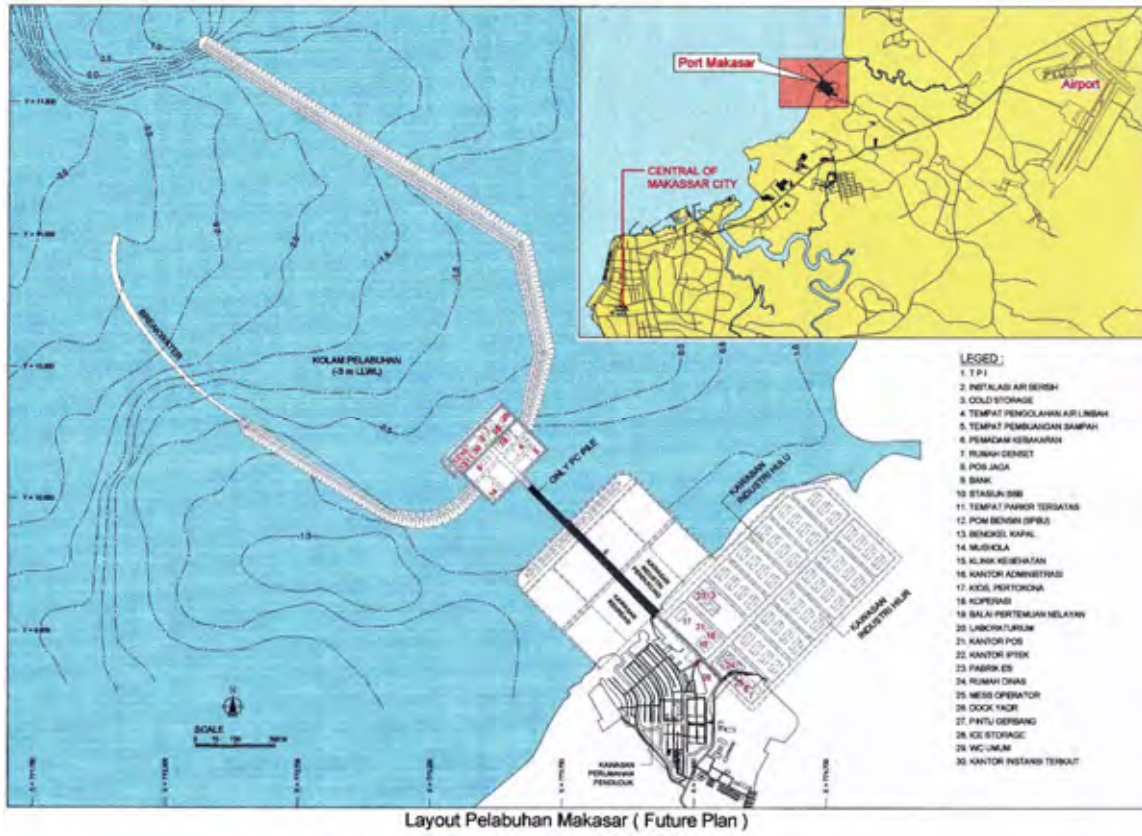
PPN Untia development plan (Source: Survey team)
